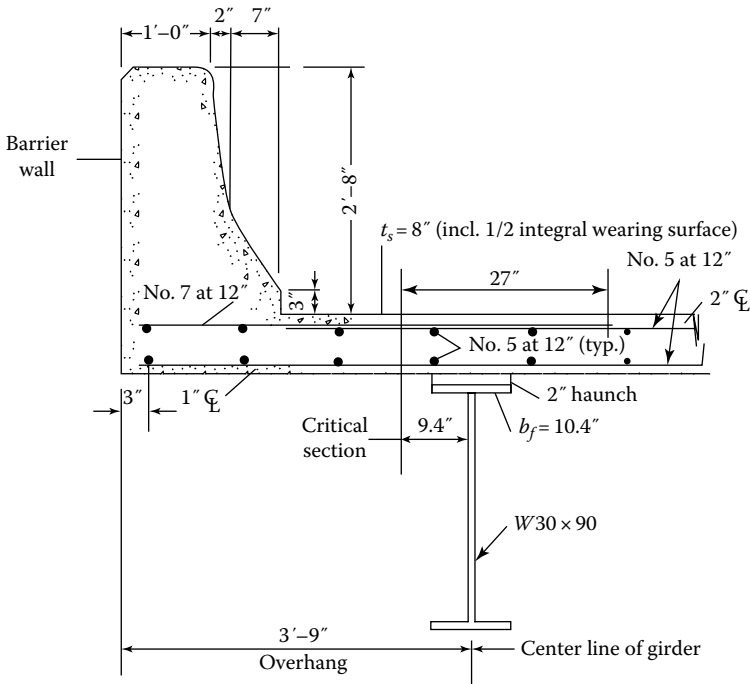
Reinforcement details for the deck overhang. (Reinforcement from the barrier wall will also be anchored inside the overhang; those reinforcement details are not shown here.)
